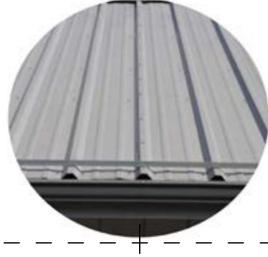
BT: Metal (CWRoofing, [n.d.]: online)
